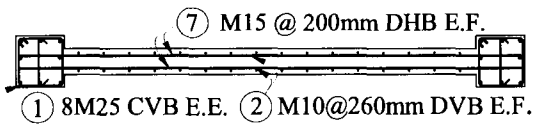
Shear wall reinforcement in B6 building located in Montréal.
